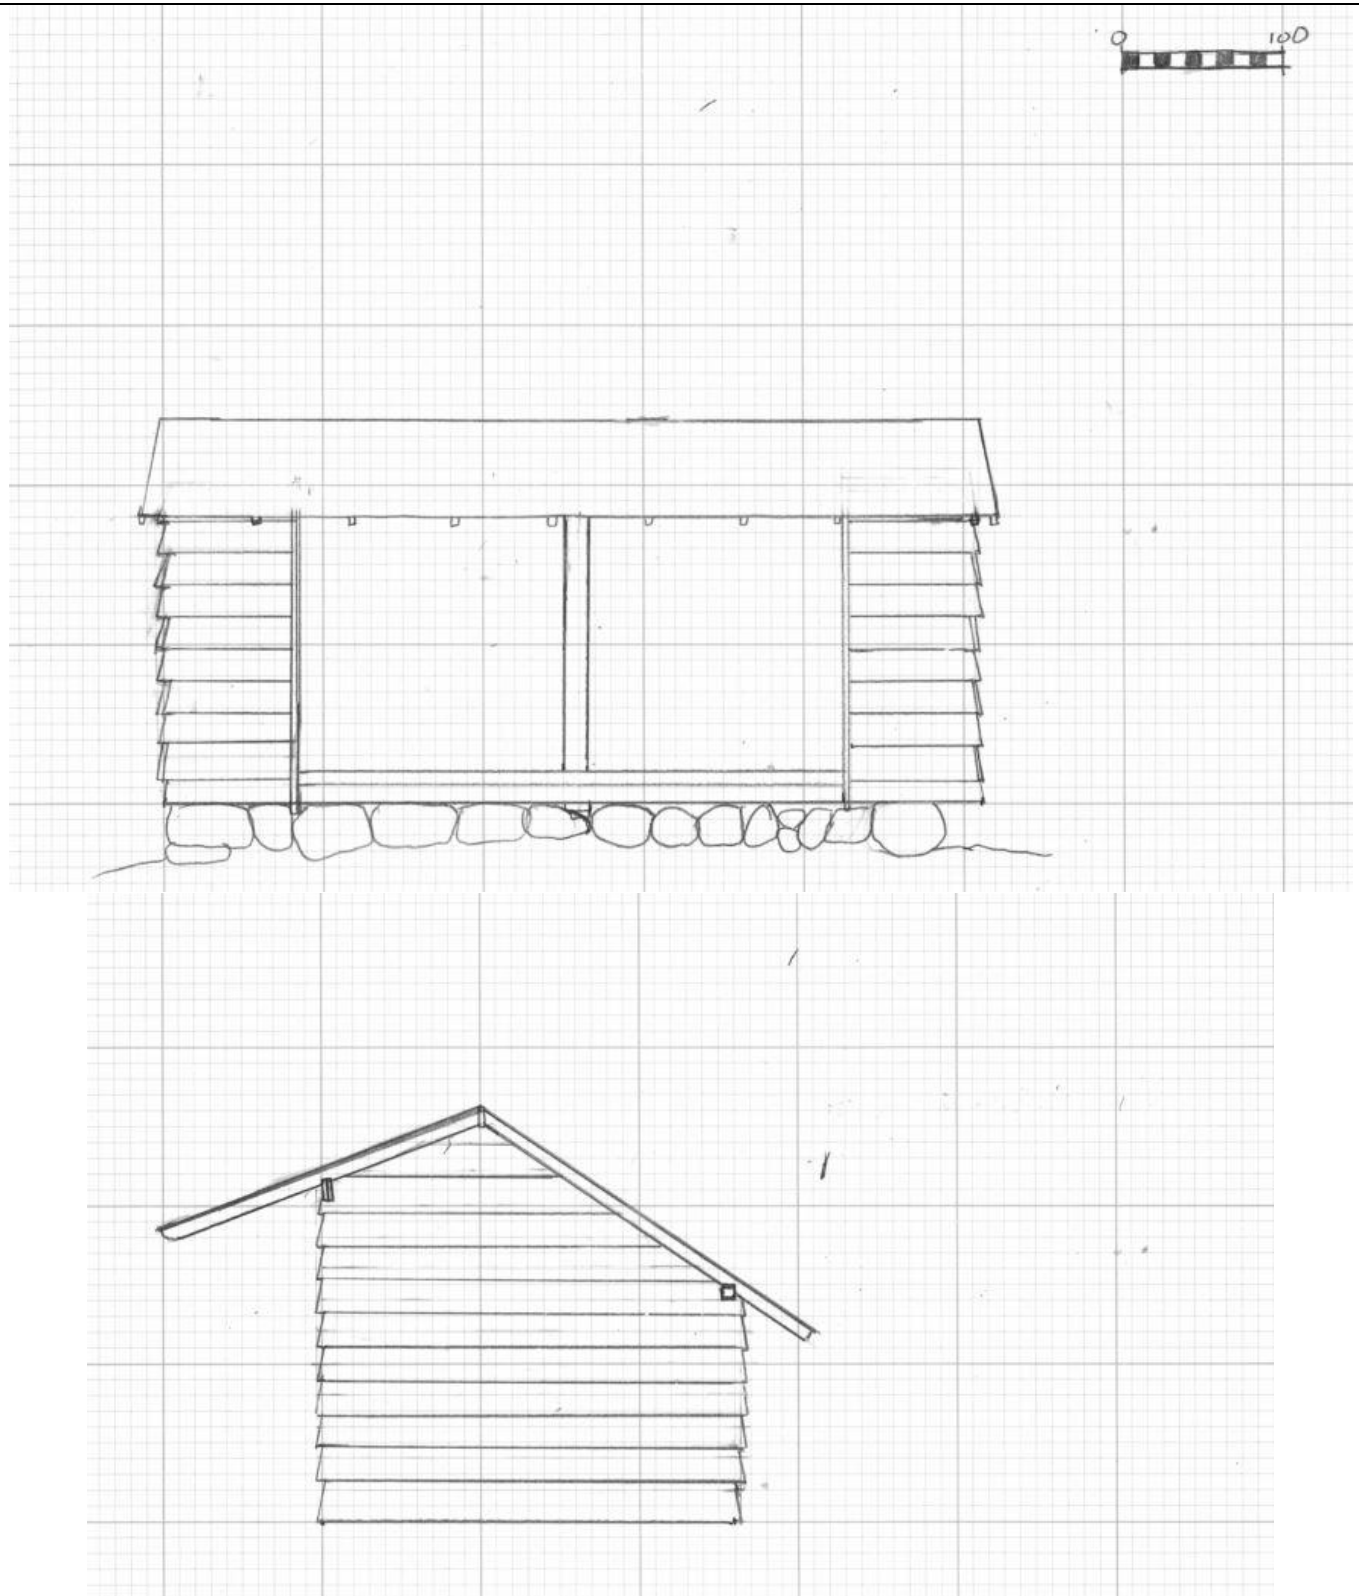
Rattle River shelter drawings. Above: Northwest (front) elevation. Below: Southeast side elevation. October 5, 2011.
